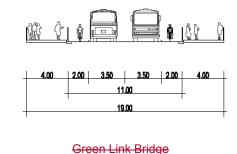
P Greenlink corridor (dedicated alignment) - typical cross section
